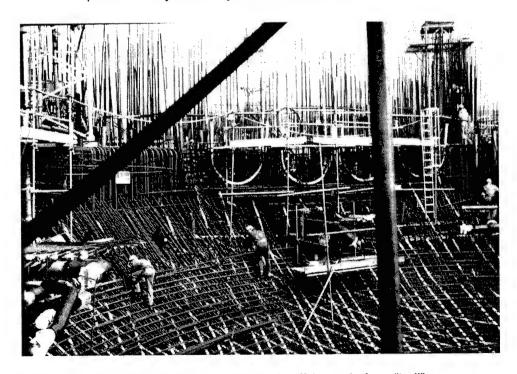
Laying out post-tensioning ducts in offshore platform "troll"
